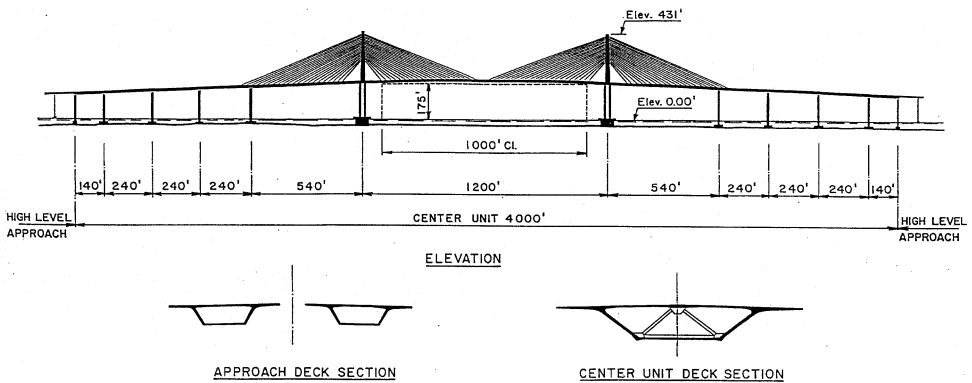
Sunshine Skyway Bridge, Florida — elevation.
